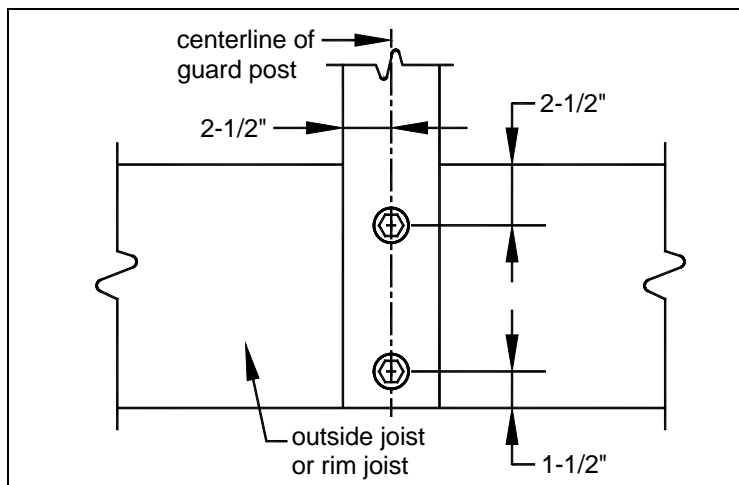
GUARD POST ATTACHMENT DETAIL
